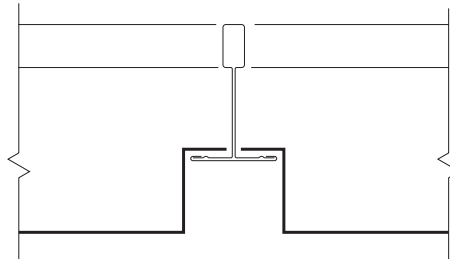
Accentuated longitudinal/transverse joint; Example B (lay-in assembly)
